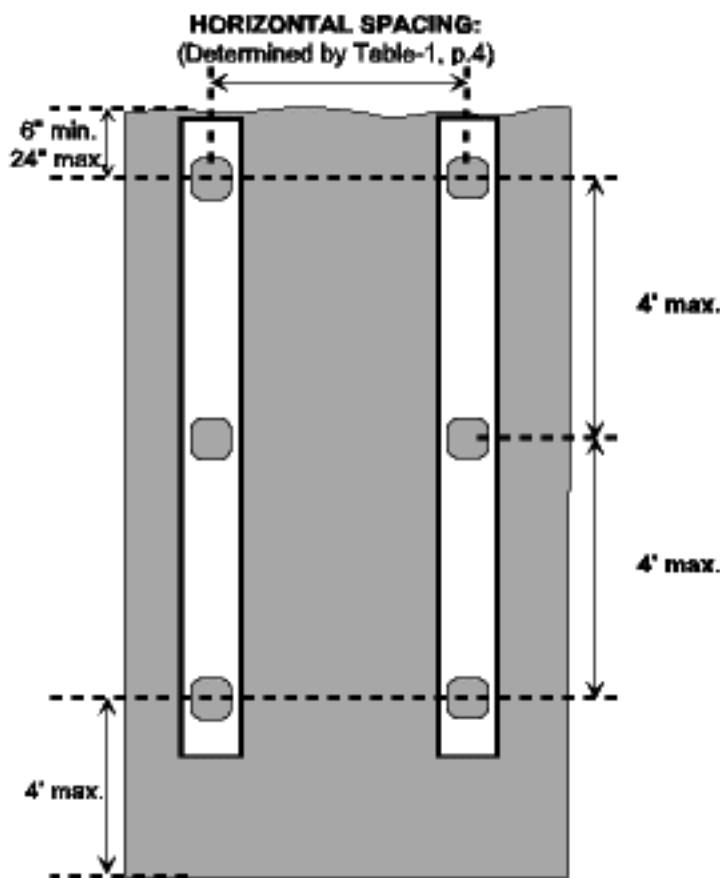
Allowable placement of uprights in trenches where plywood sheeting is not required
